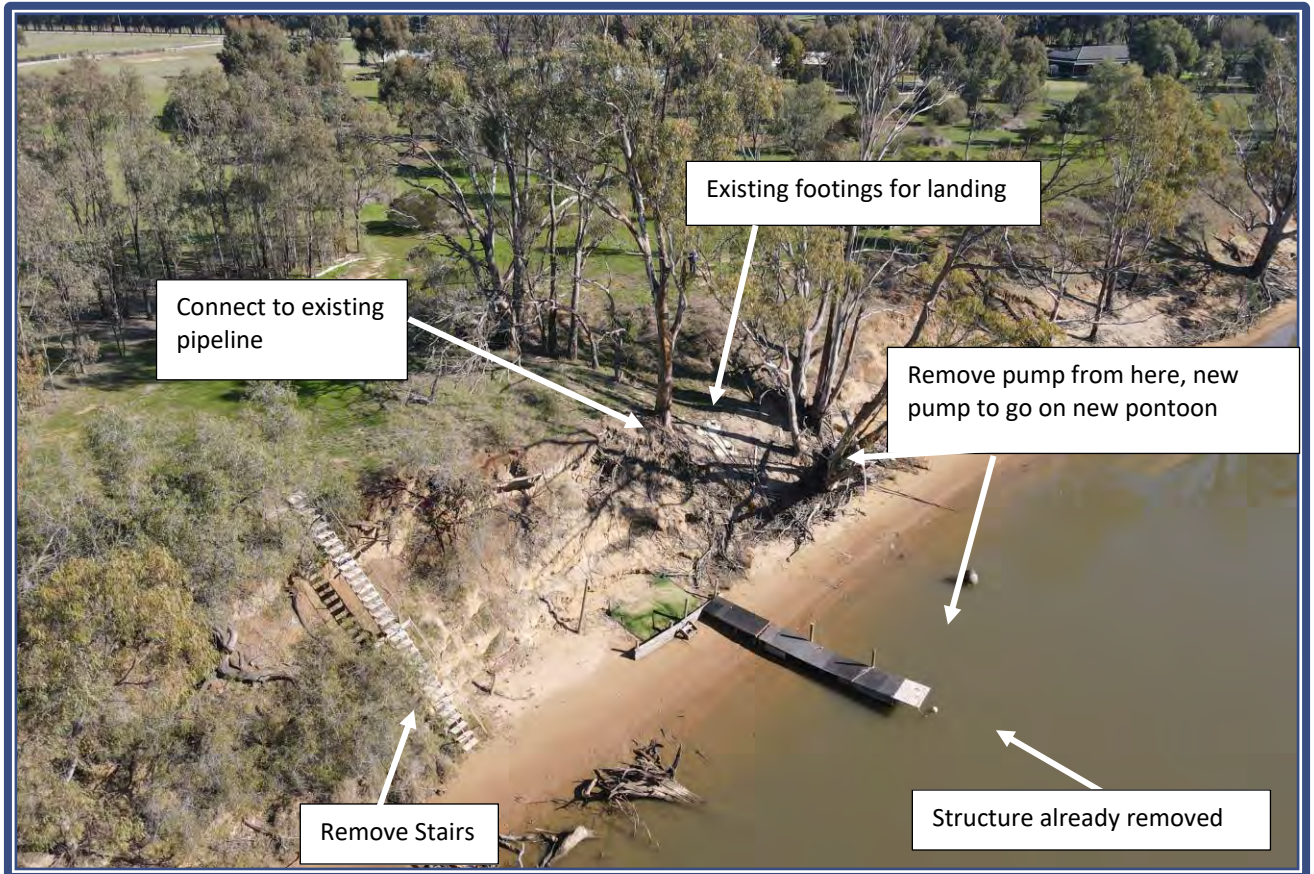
Aerial view of site looking downstream showing infrastructure for replacement and proposed works location (Source: PRS)
